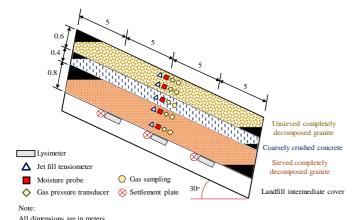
Typical cross section view and layout of instrumentation in the test site (Ng et al. 2018a)
